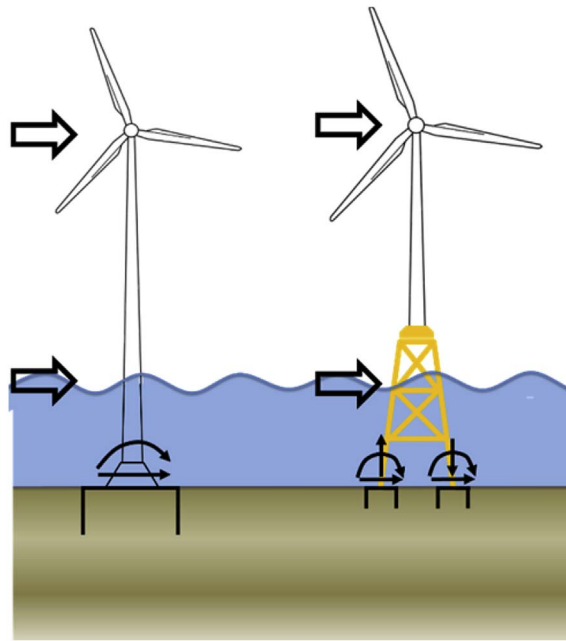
Skirted foundations (buckets) supporting a) a mono tower and b) a jacket.
